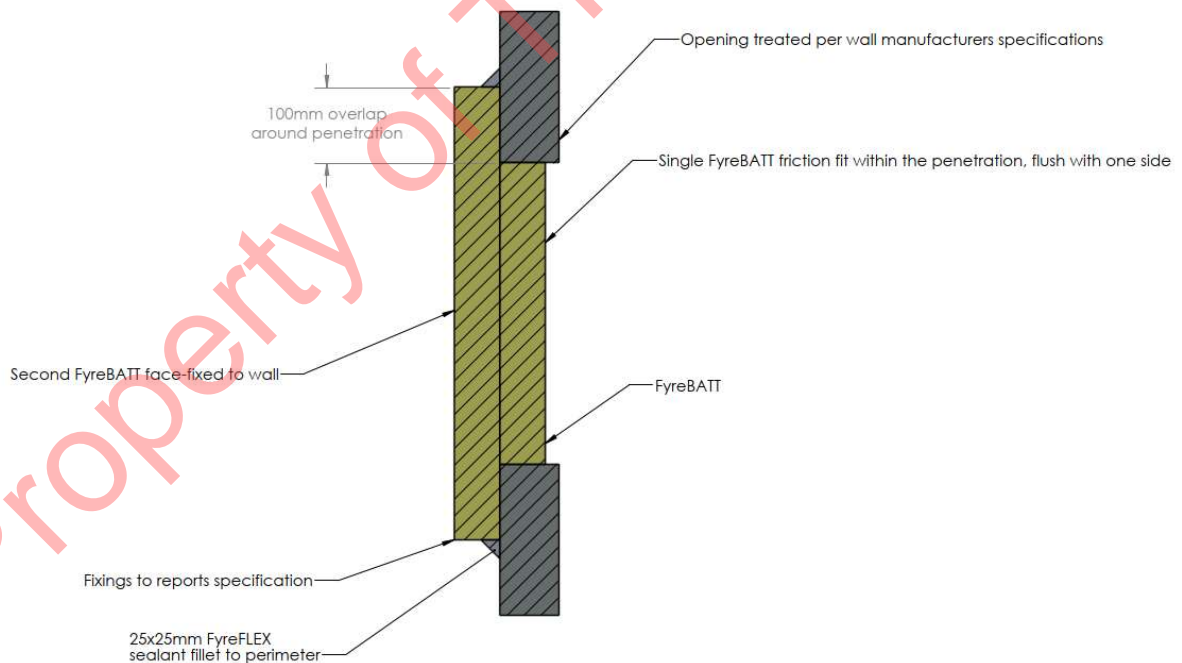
Blank seal protected with patress fit FyreBATT in Speedpanel, Hebel, Walsc and 1 x 13 mm or 16 mm plasterboard wall
